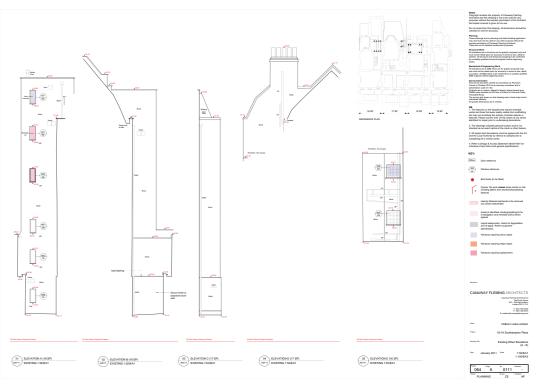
(Above, Left) - Front Elevation, as Existing (Canaway Fleming Architects, 2011). Figure 42 (Above, Right) - Back Elevation, as Existing (Canaway Fleming Architects, 2011). Figure 43 (Below, Left) - No. 19, Side Elevation, as Existing (Canaway Fleming Architects, 2011). Figure 44 (Below, Right) - Other Elevations, as Existing (Canaway Fleming Architects, 2011).
